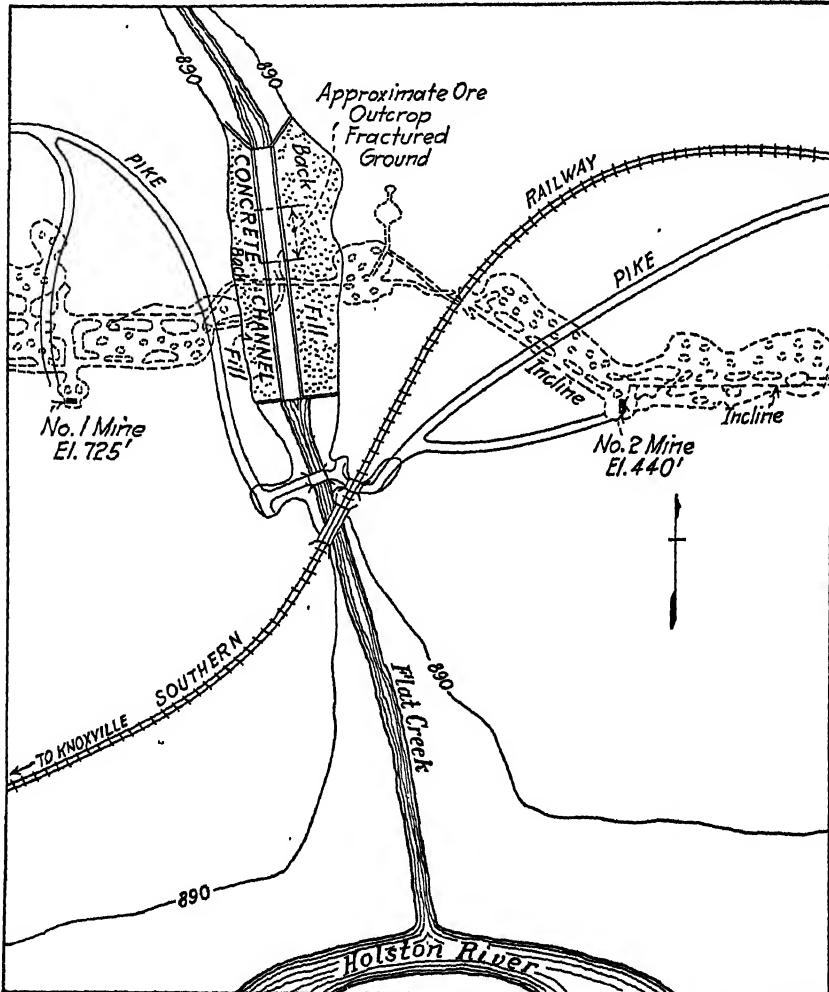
RELATION OF CONCRETE CHANNEL TO MINE WORKINGS.
